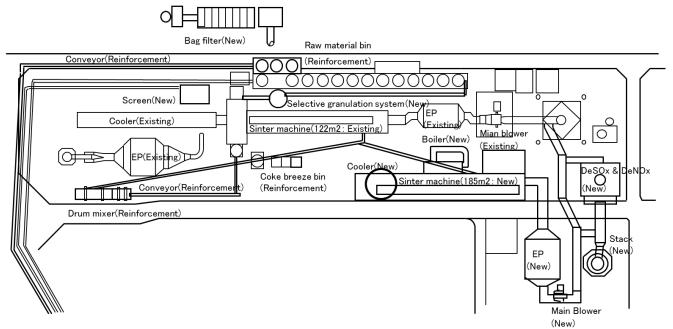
Layout of Wakayama Works No. 5 sintering plant
